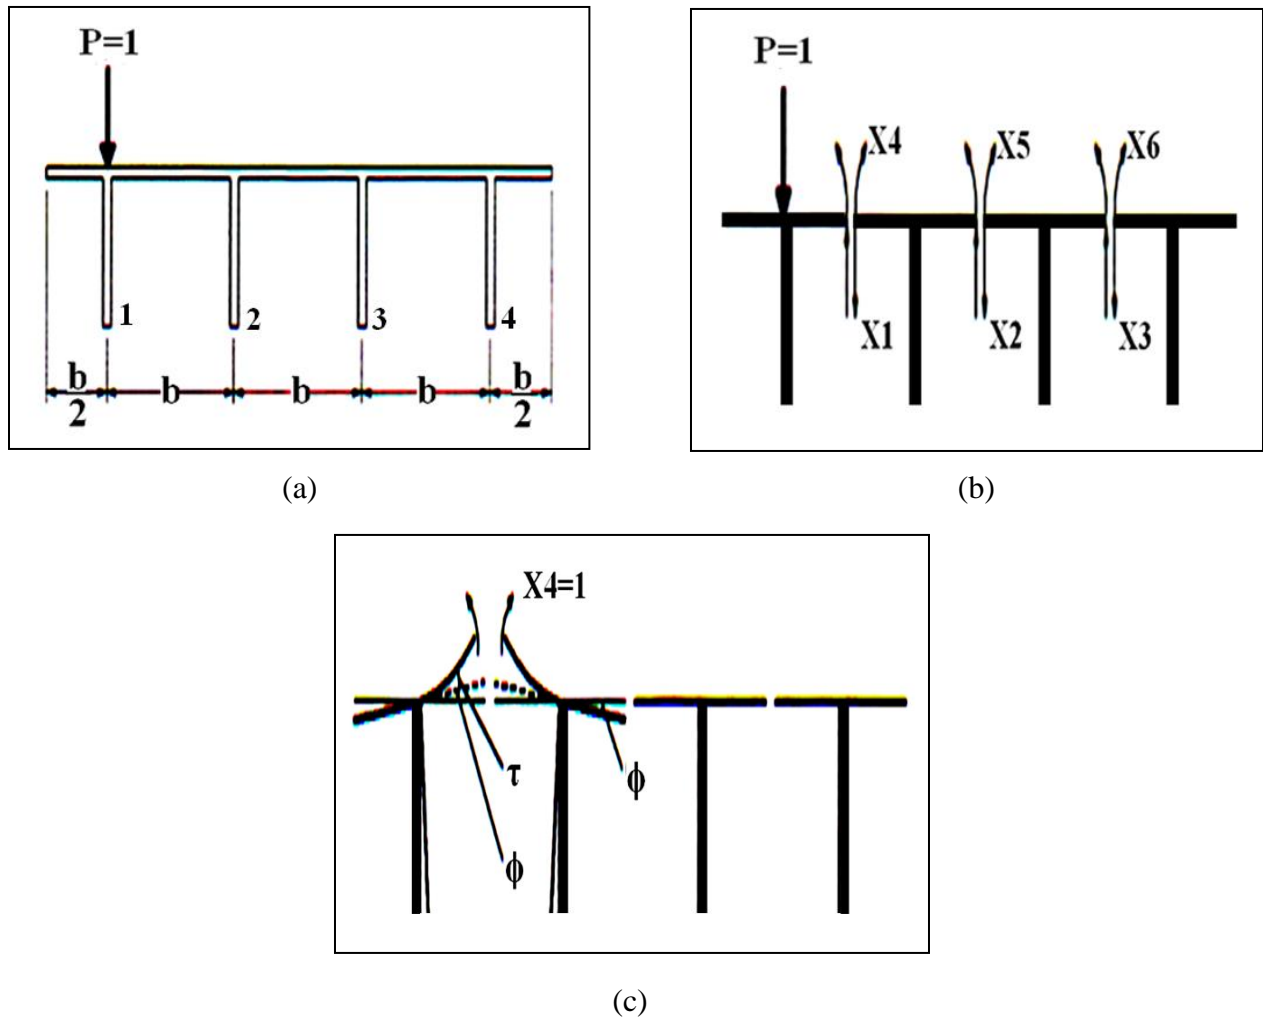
Free body diagram of fixed joint girder bridge [39].
